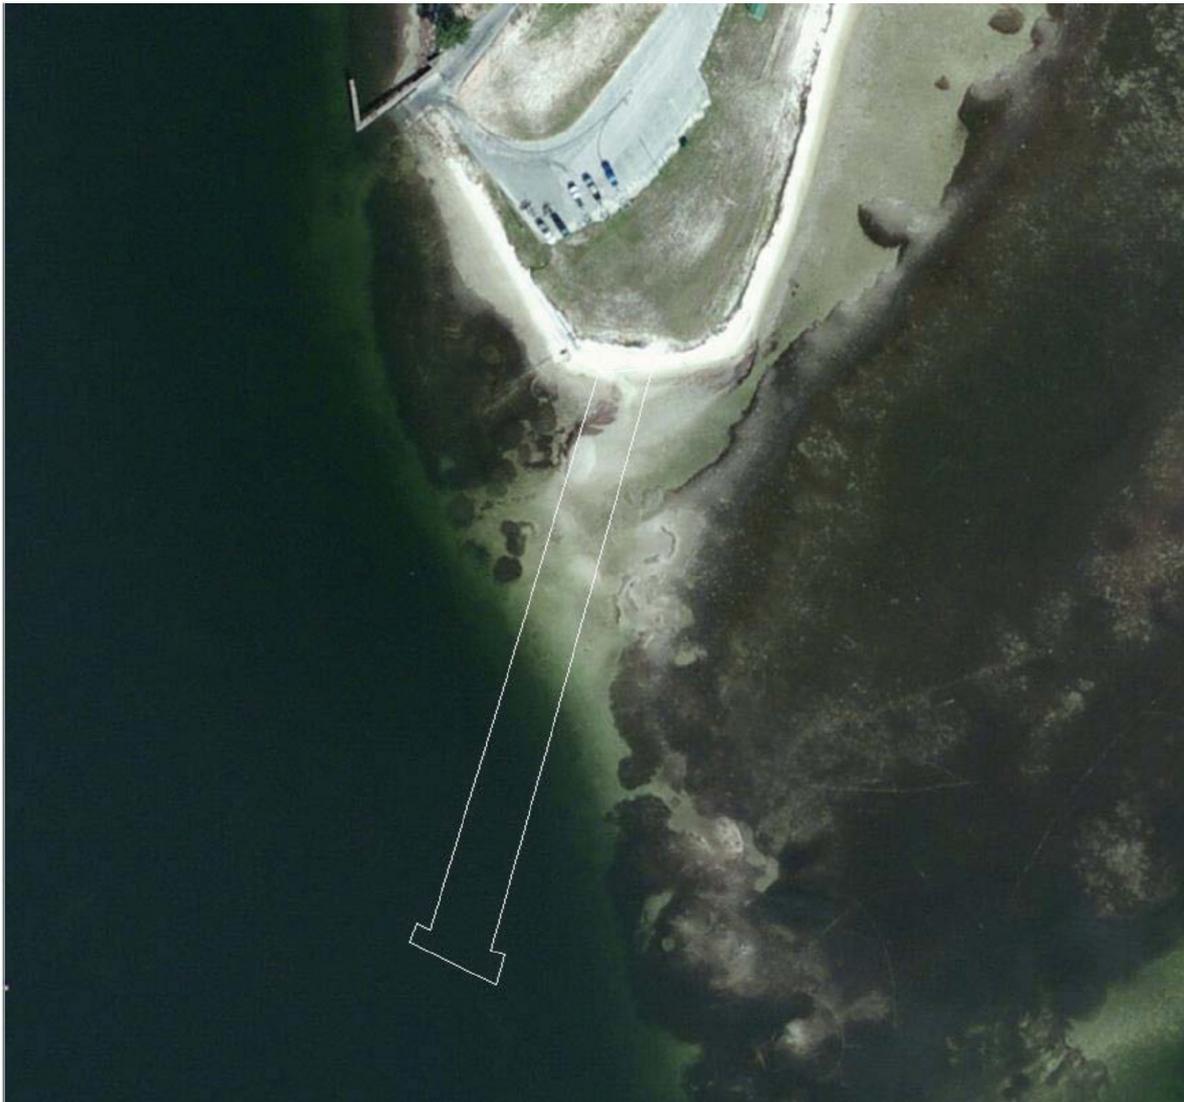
Conceptual design and initial proposed location for the proposed Oak Shore Drive Pier.
